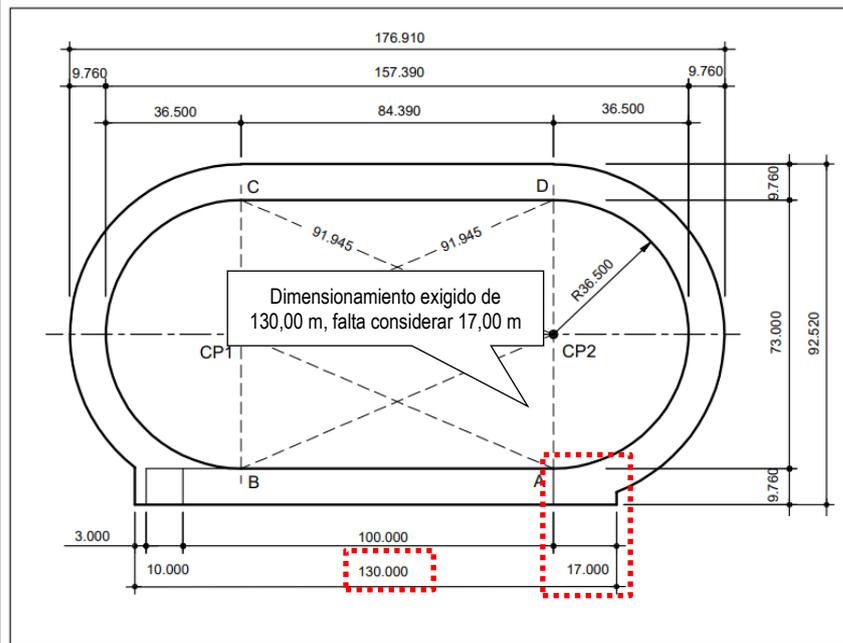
Setting out plan and dimensions of the 400m Standard Track (Dimensions in m)
